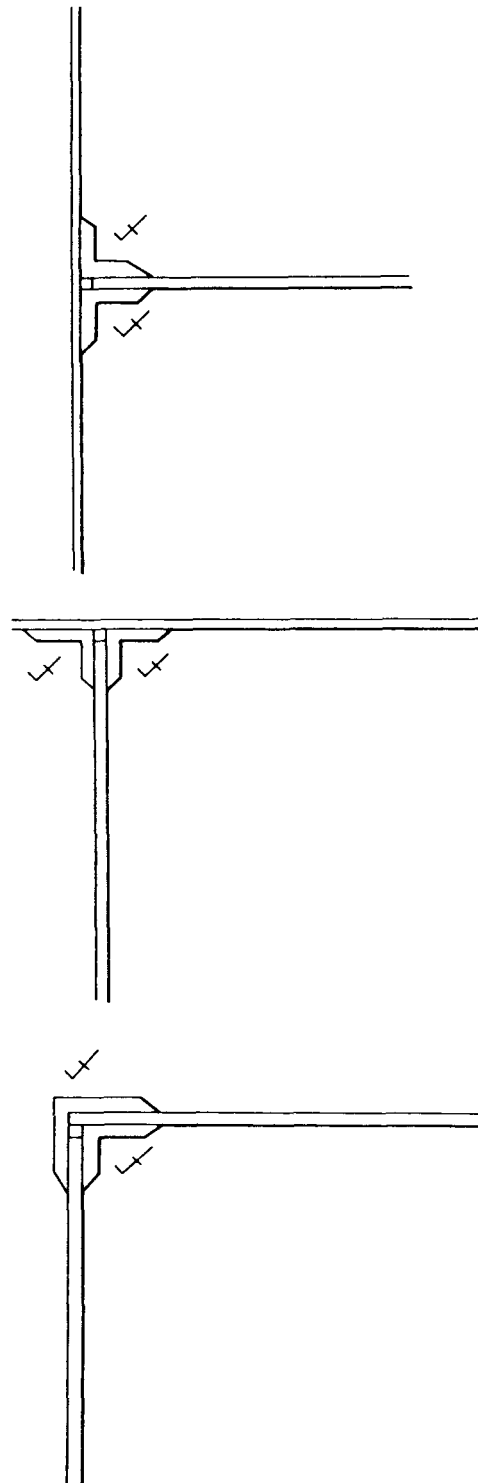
CORNER JOINTS BETWEEN GRP PANELS
